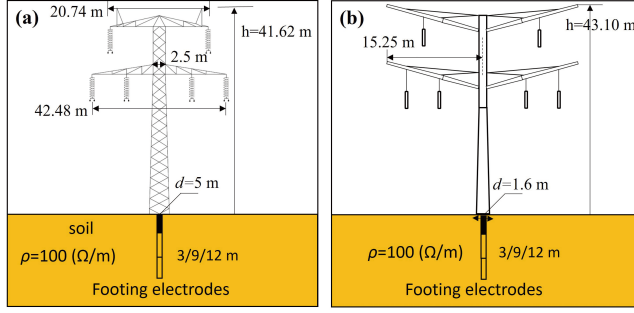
(a) Donau tower and (b) Eagle tower configuration. Source: C2 [94].
